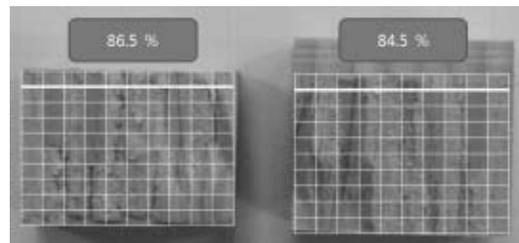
Measuring of Wood Failure (Parallel laminating, Specimen No. 12).
